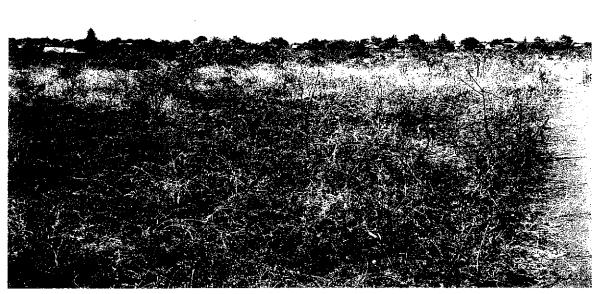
View of the proposed new site where new Malamulele high school would be constructed.
